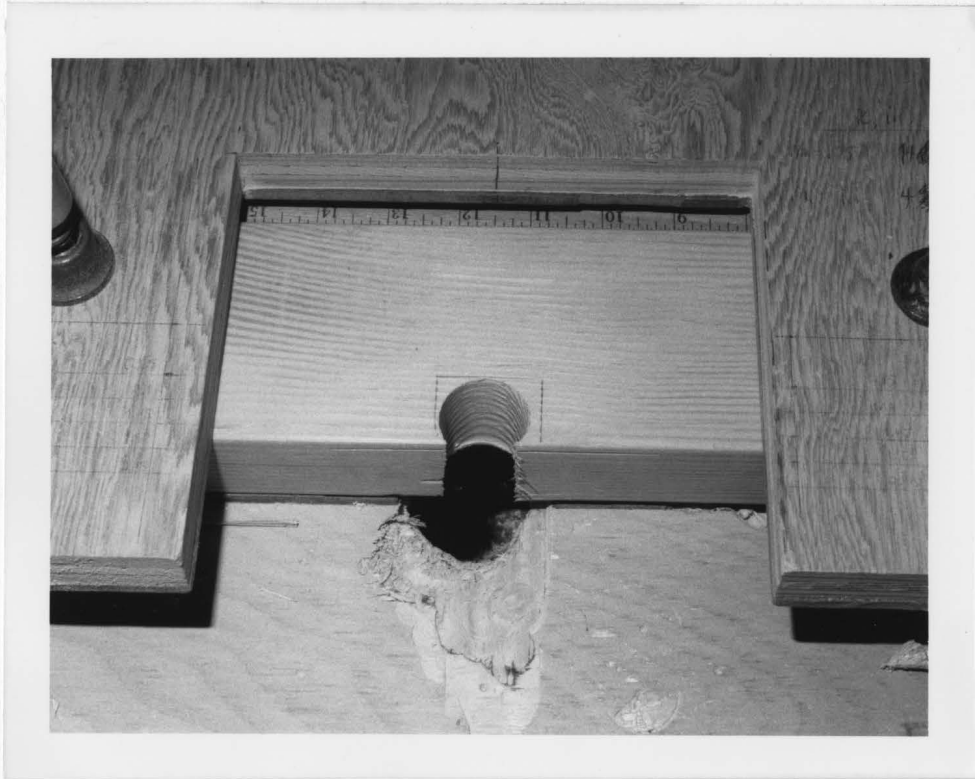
The beam of Figure 11 after rough machining a notch using the drill and bit shown in Figure 12.
